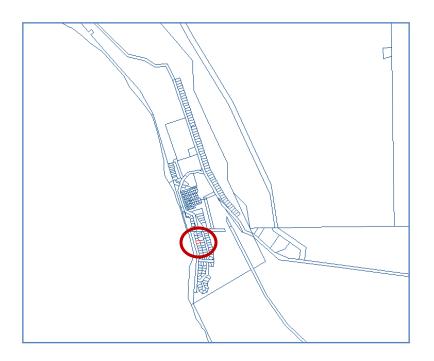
Site plan of Lot 200 (No. 65) Glance Street, Horrocks
